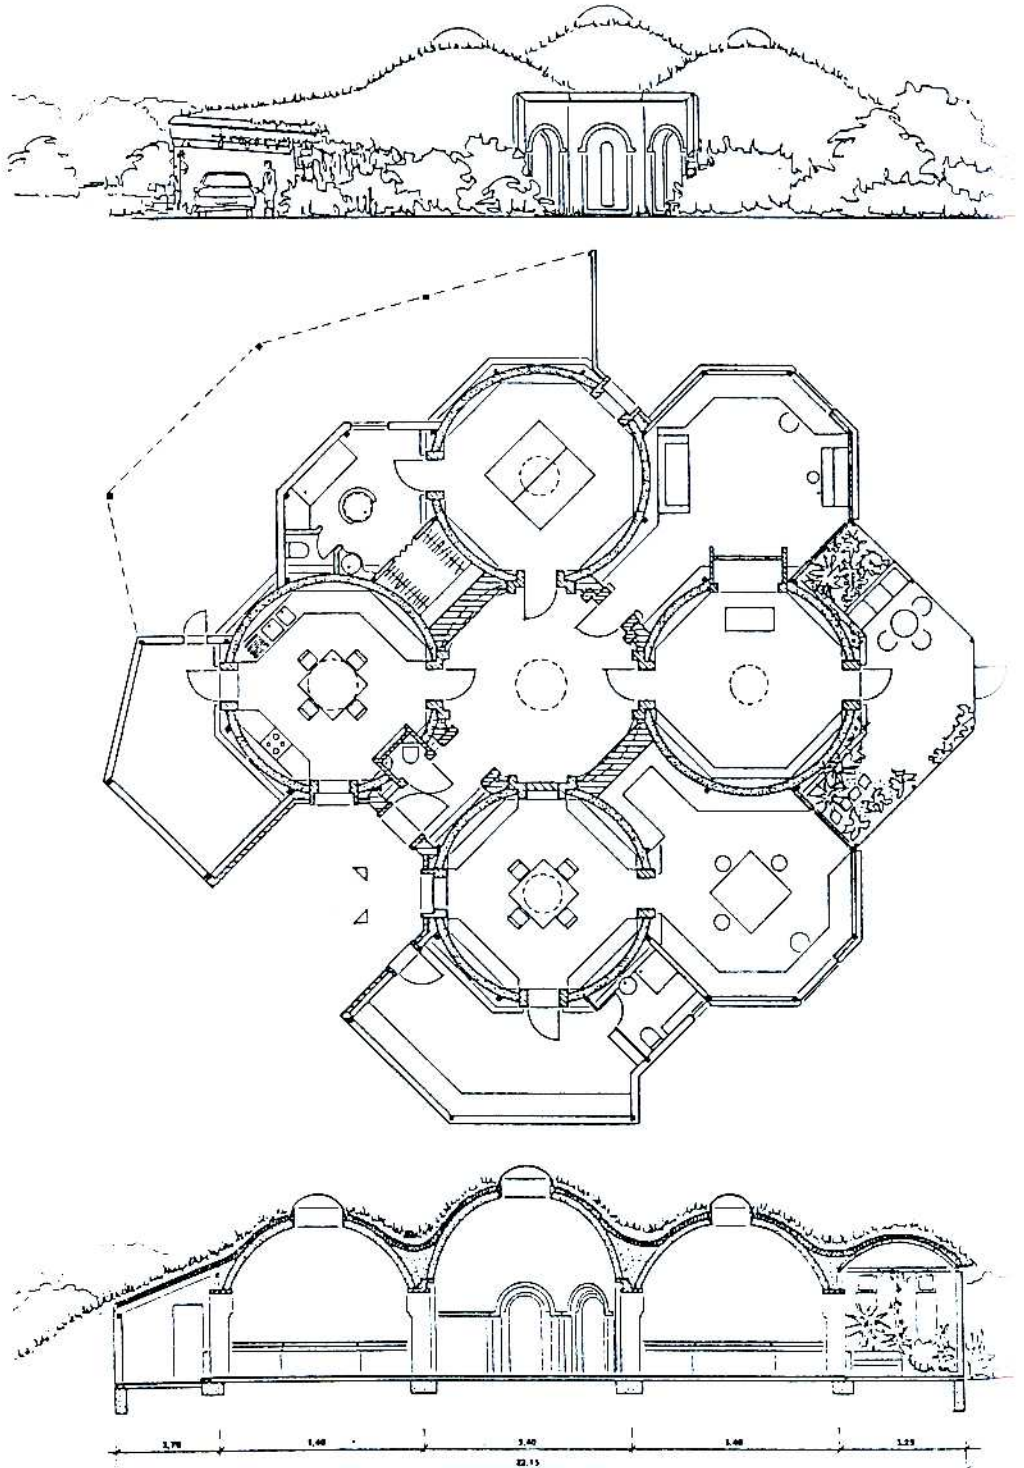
Plan, section and elevations of an earth burned mud dome house covered by a green grass roof.
